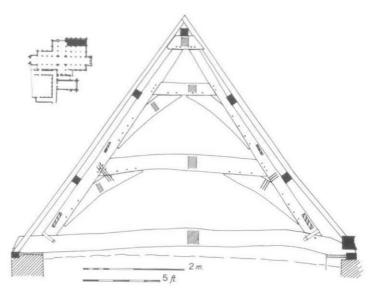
Latin Chapel: 14th-century roof-truss, looking E.
